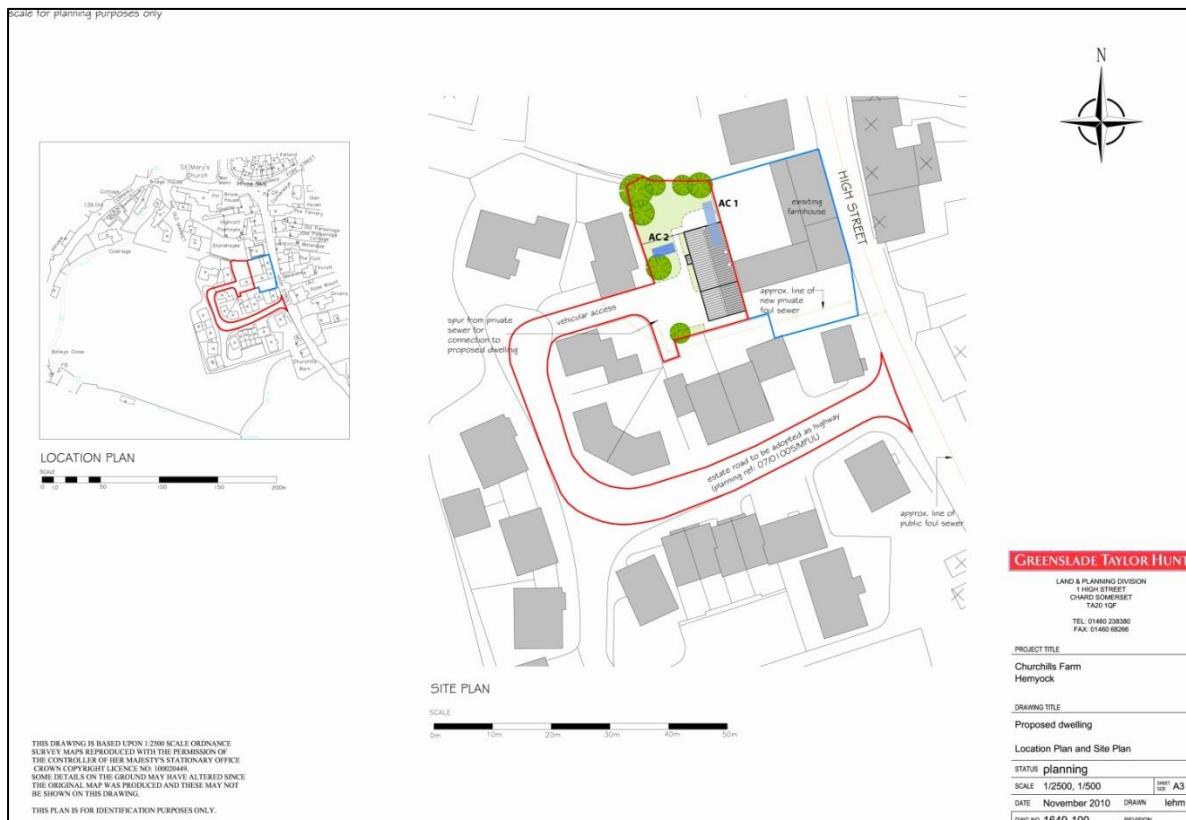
Position of proposed development area. The published positions of AC Archaeology's 2009 trenches 1 and 2 are shown (AC1 / AC2); the floor plan (from the WSI) is of the building originally proposed, not that constructed as a result of the revised application.
